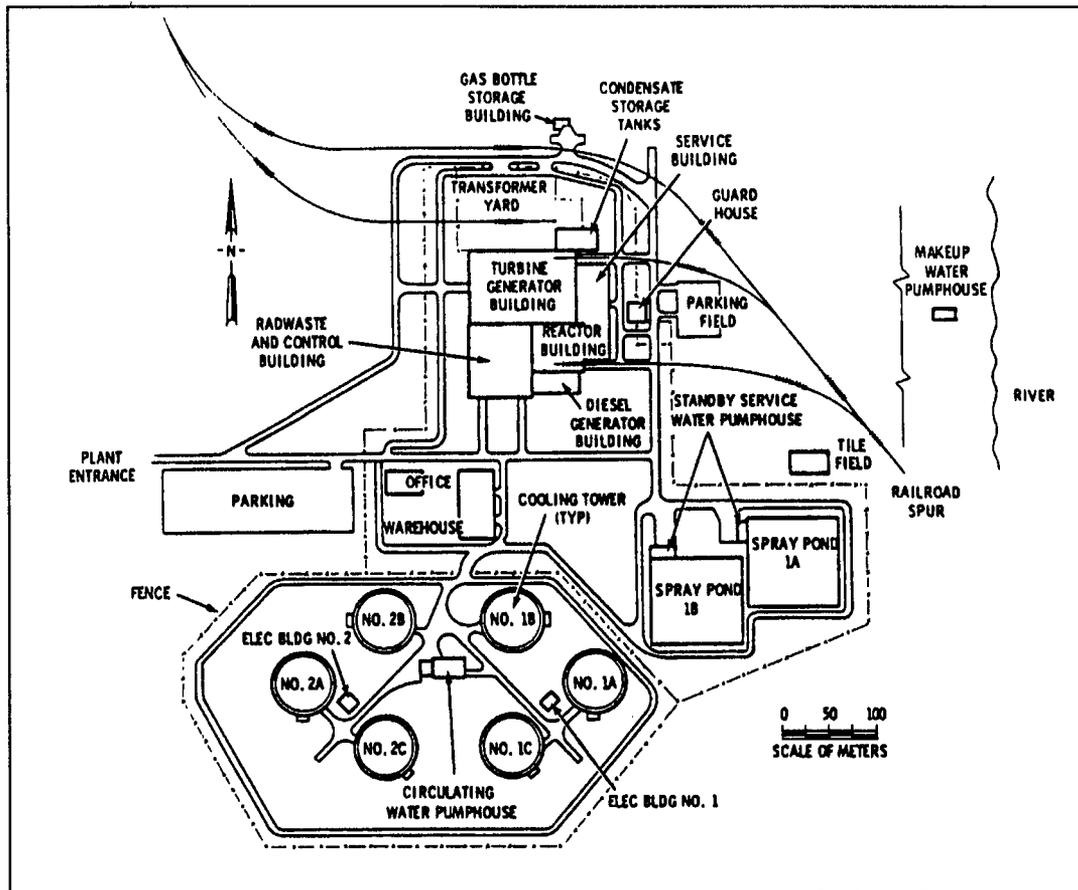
Site layout on a typical boiling-water reactor power plant. Adapted from NUREG-0672.
